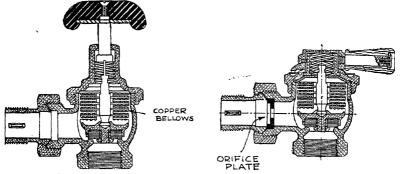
(a).—Packless Radiator Valve (Dunham).
